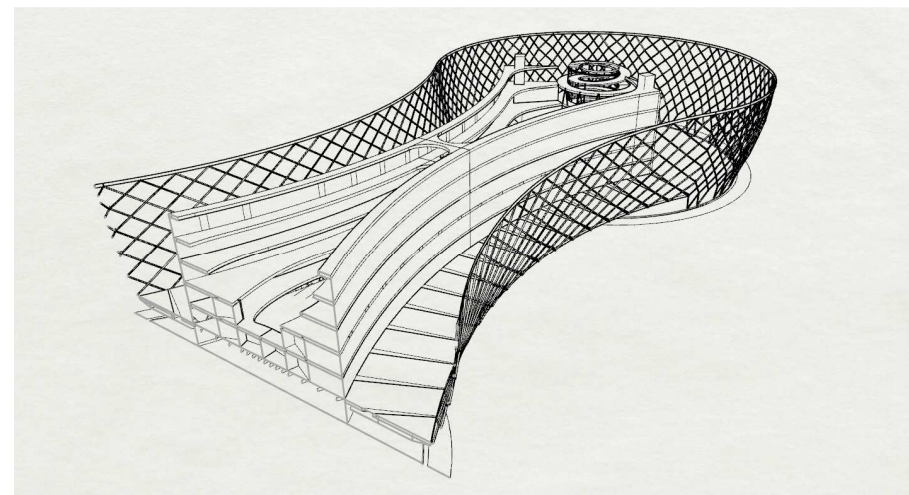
Rendering showing the section and tree main strength element the framing façade element, the main load bearing atrium walls and the 2<sup>nd</sup> floor as a whole.
